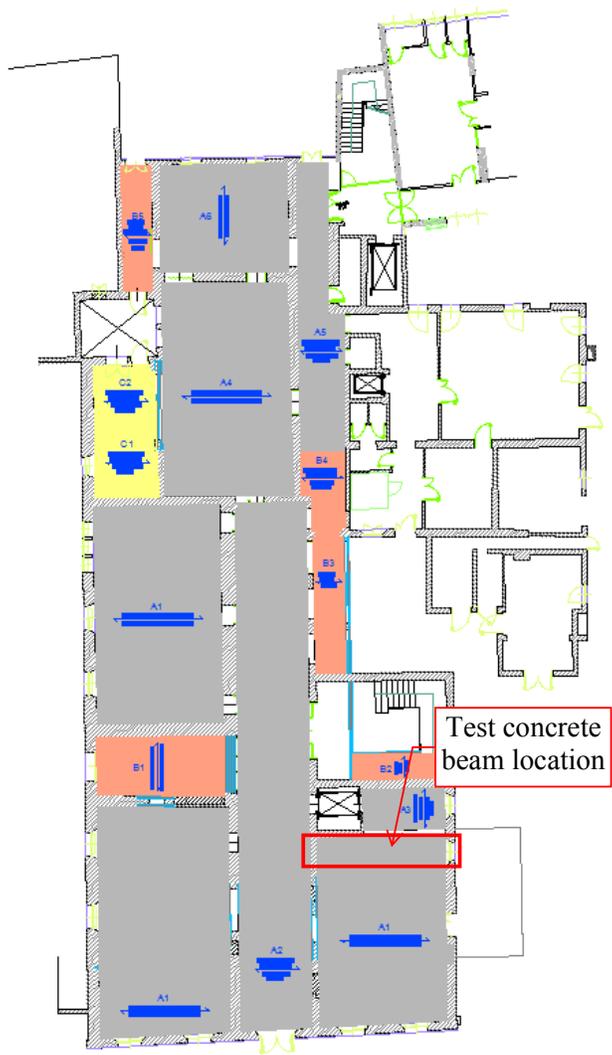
Roof system at ground floor for the hospital main building (H1)
